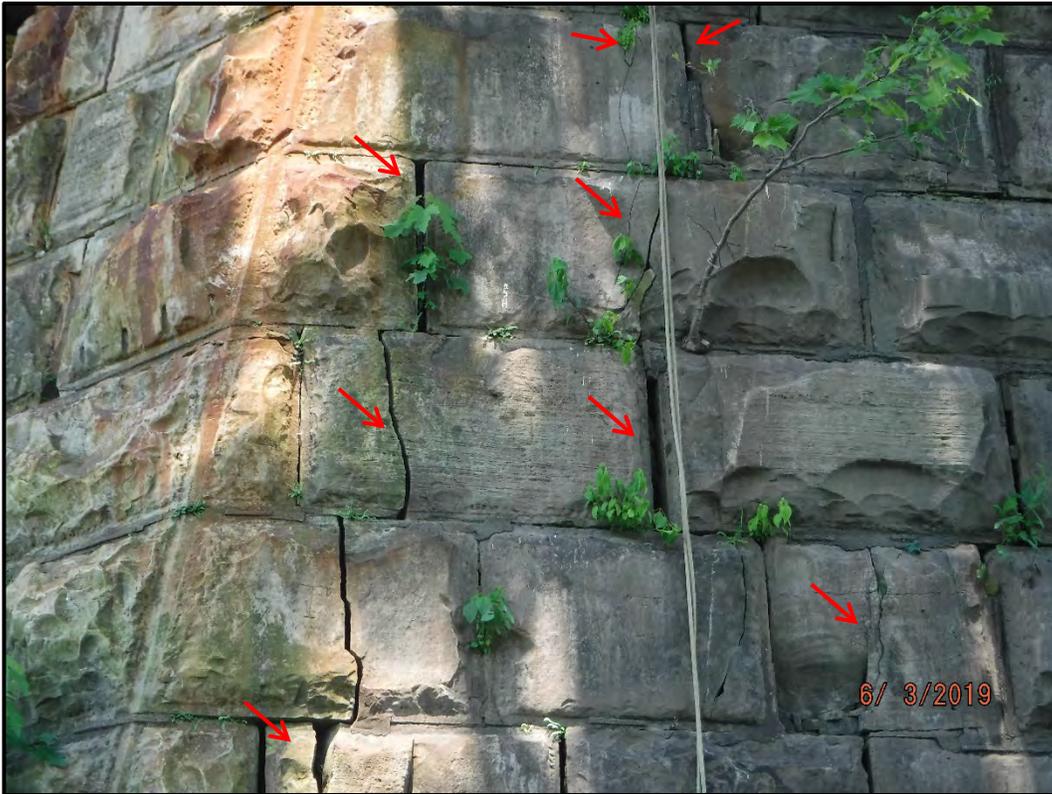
Vertical cracking on the east face of Pier 5 that extends from the pier cap, at the south edge of the truss beam seat, to the waterline with the crack width increasing to 7/8in wide at the waterline.
